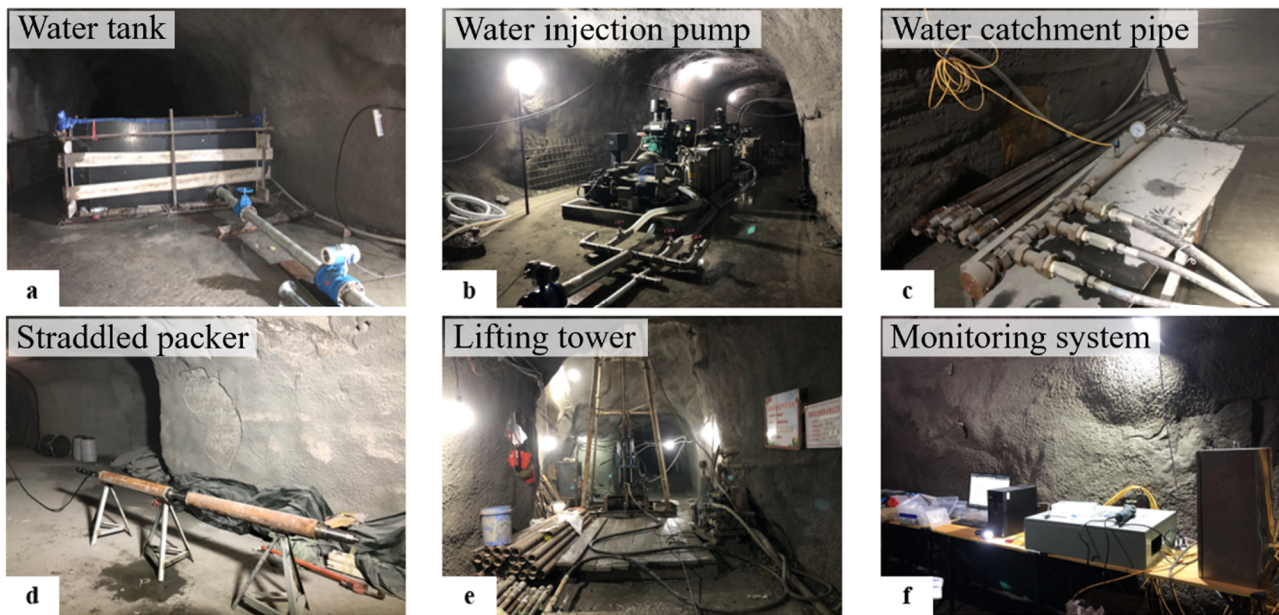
Equipment of rock mass pre-conditioning with hydraulic fracturing.
